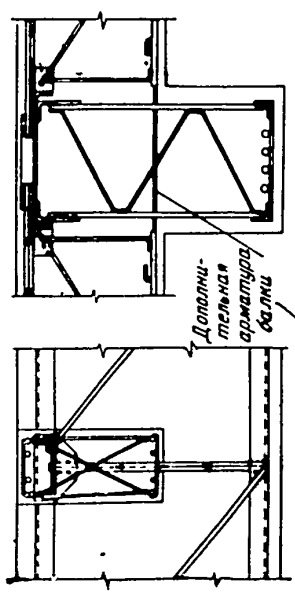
Connection of the skeleton cross-girder of the girder to the beam.
